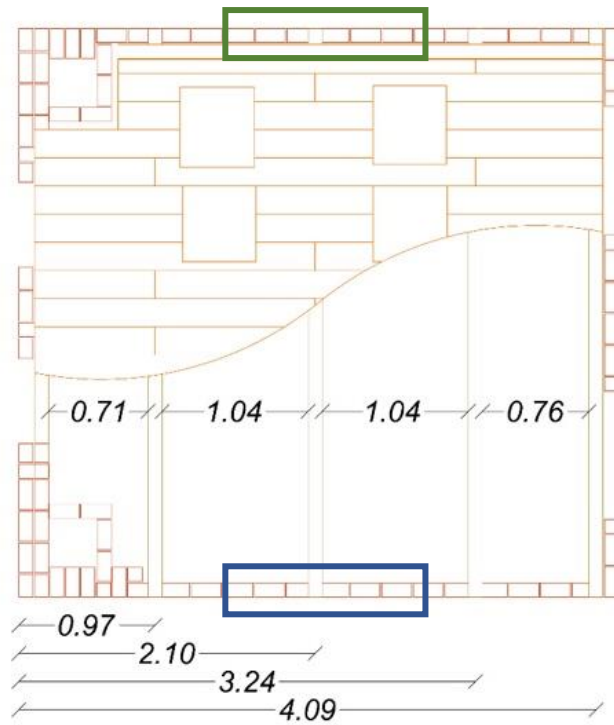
First-floor plan of the building prototype: location of the East (blue box) and West parapet walls (green box) [4, p. 5]
